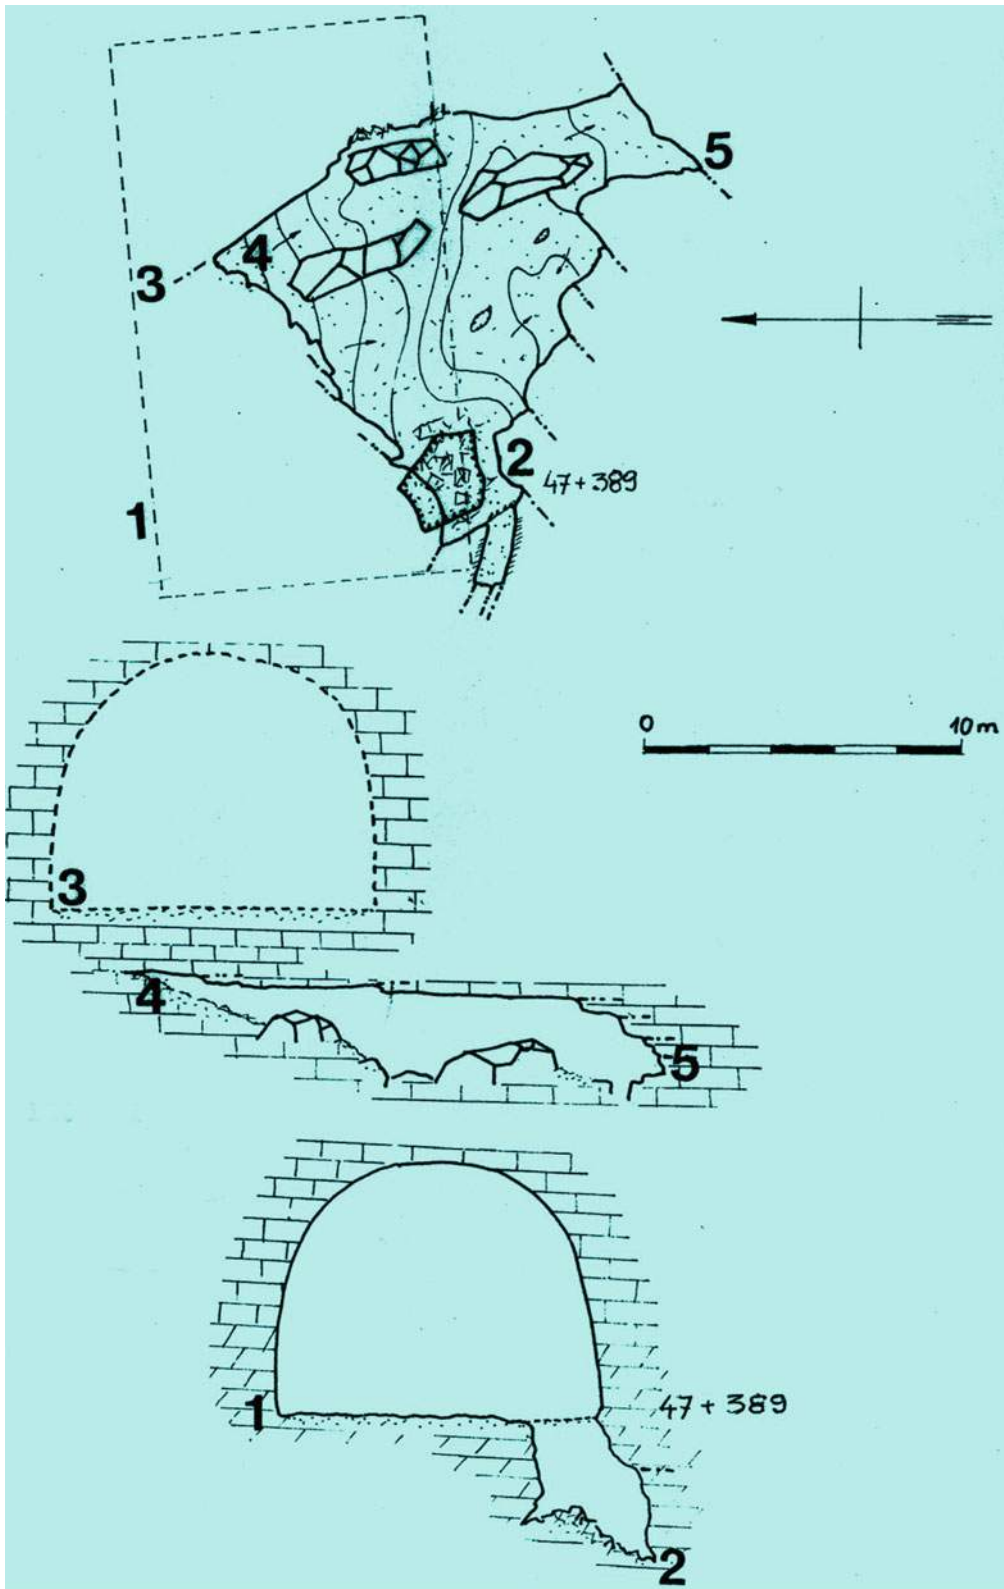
Plan and profile of cavern at km 47 + 389 in Vršek Tunnel
